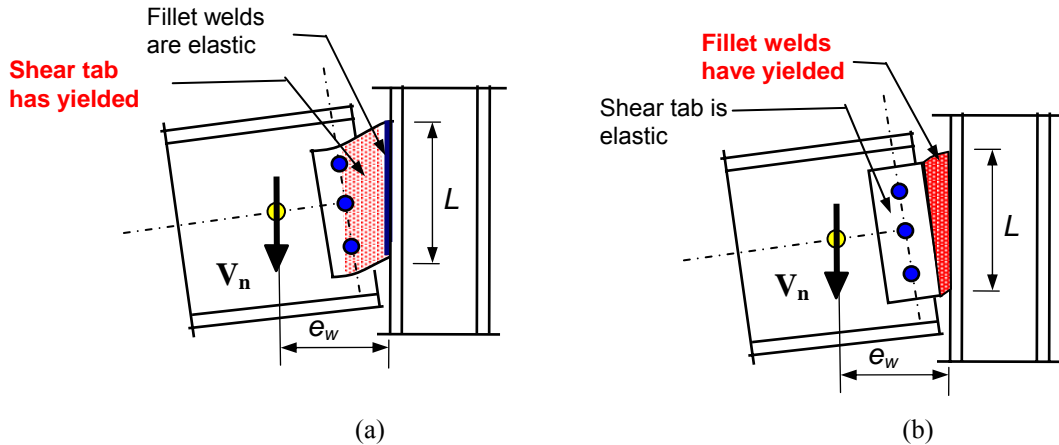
(a) Shear Tab Has Yielded Prior to the Welds; and (b) Welds Have Yielded Prior to Shear Tab
